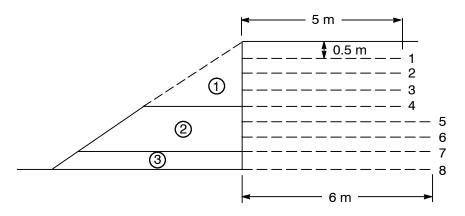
Geotextile reinforced wall on Autoroute A15, France (after Puig and Blivet 1973).
